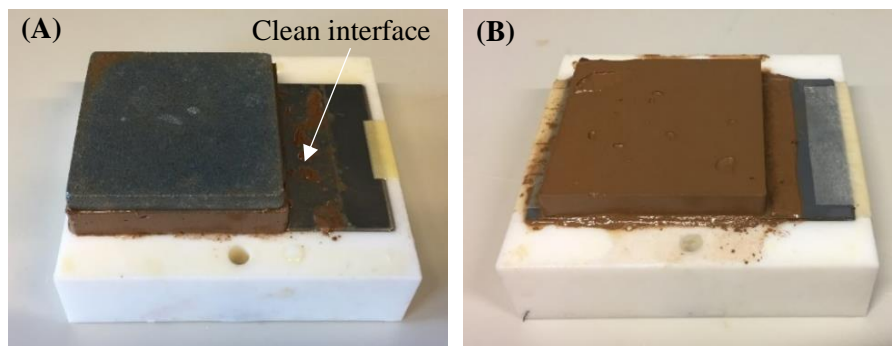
Failure mechanism of HPC on the (a) Stainless Steel and (b) Sandpaper
